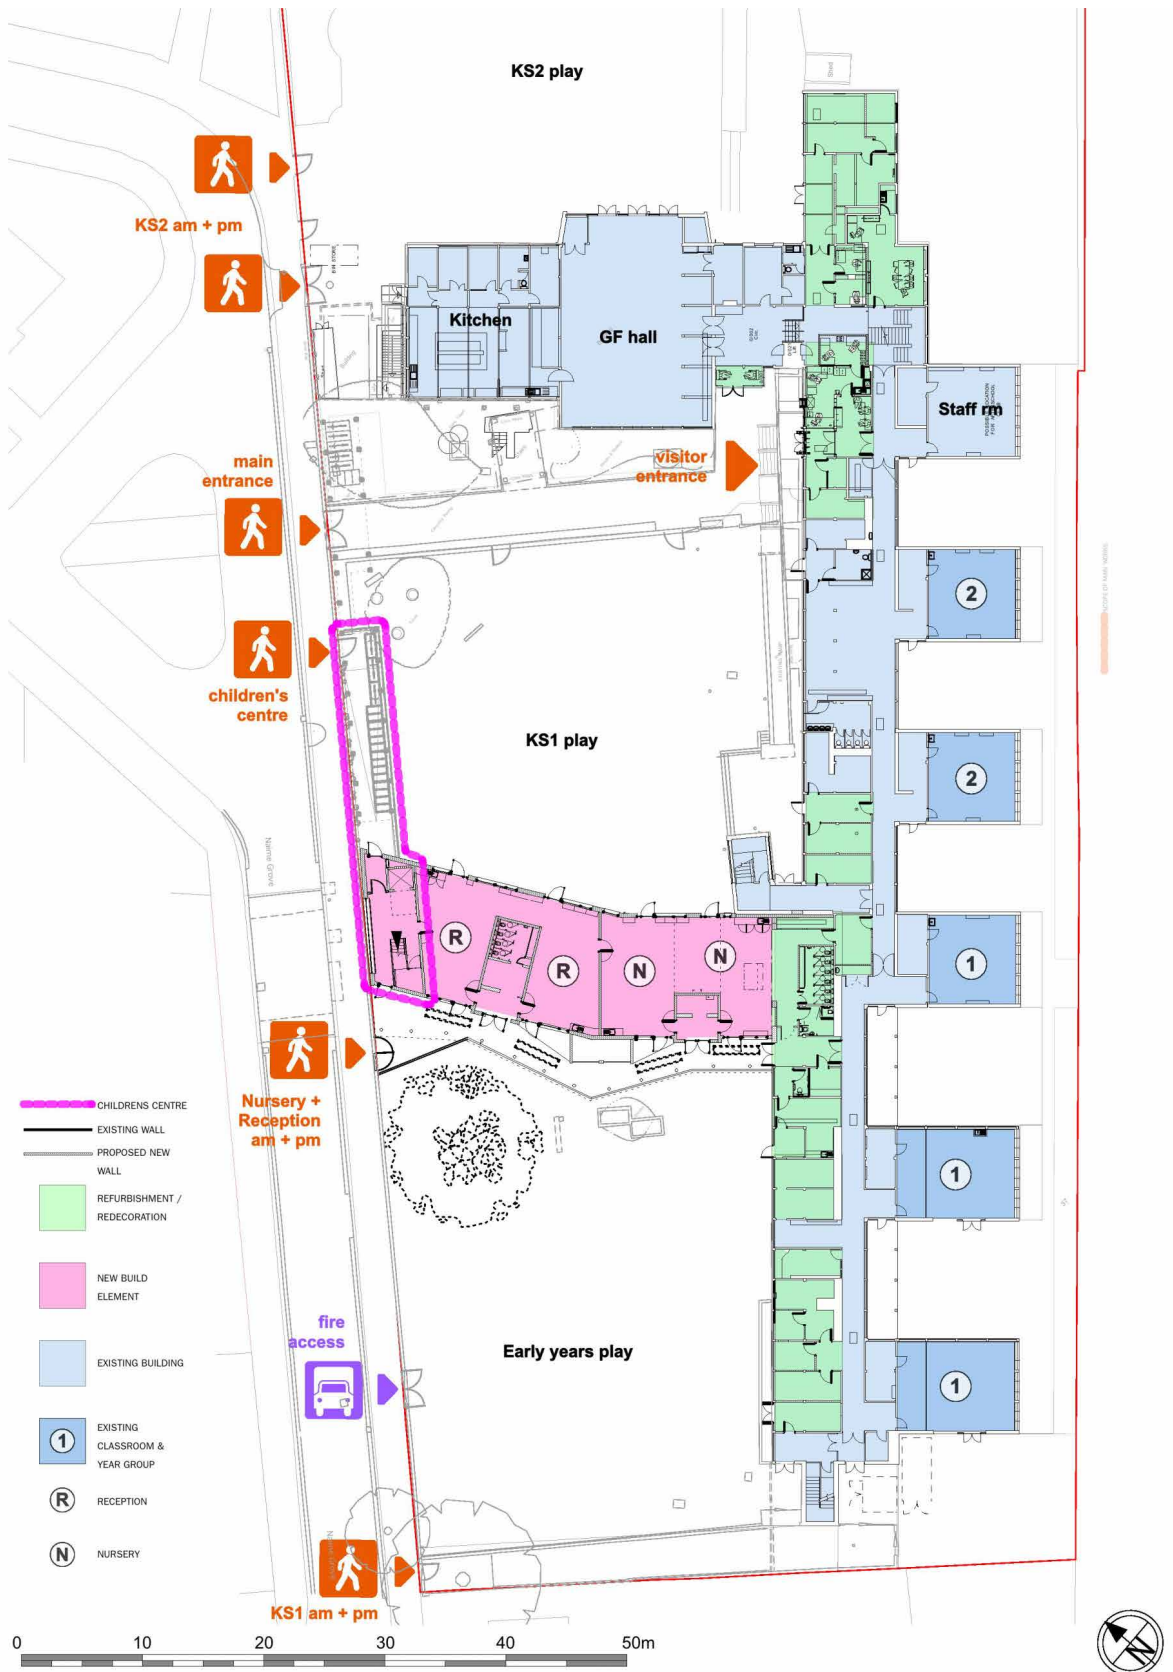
Ground Floor Plan of the 'Bessemer Grange' site - showing the New Building in pink
